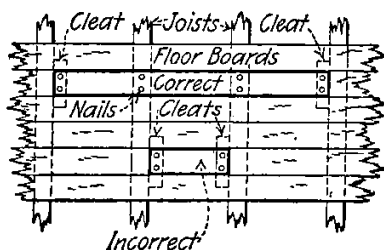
Methods of locating cleats to support floor boards that have been removed.
